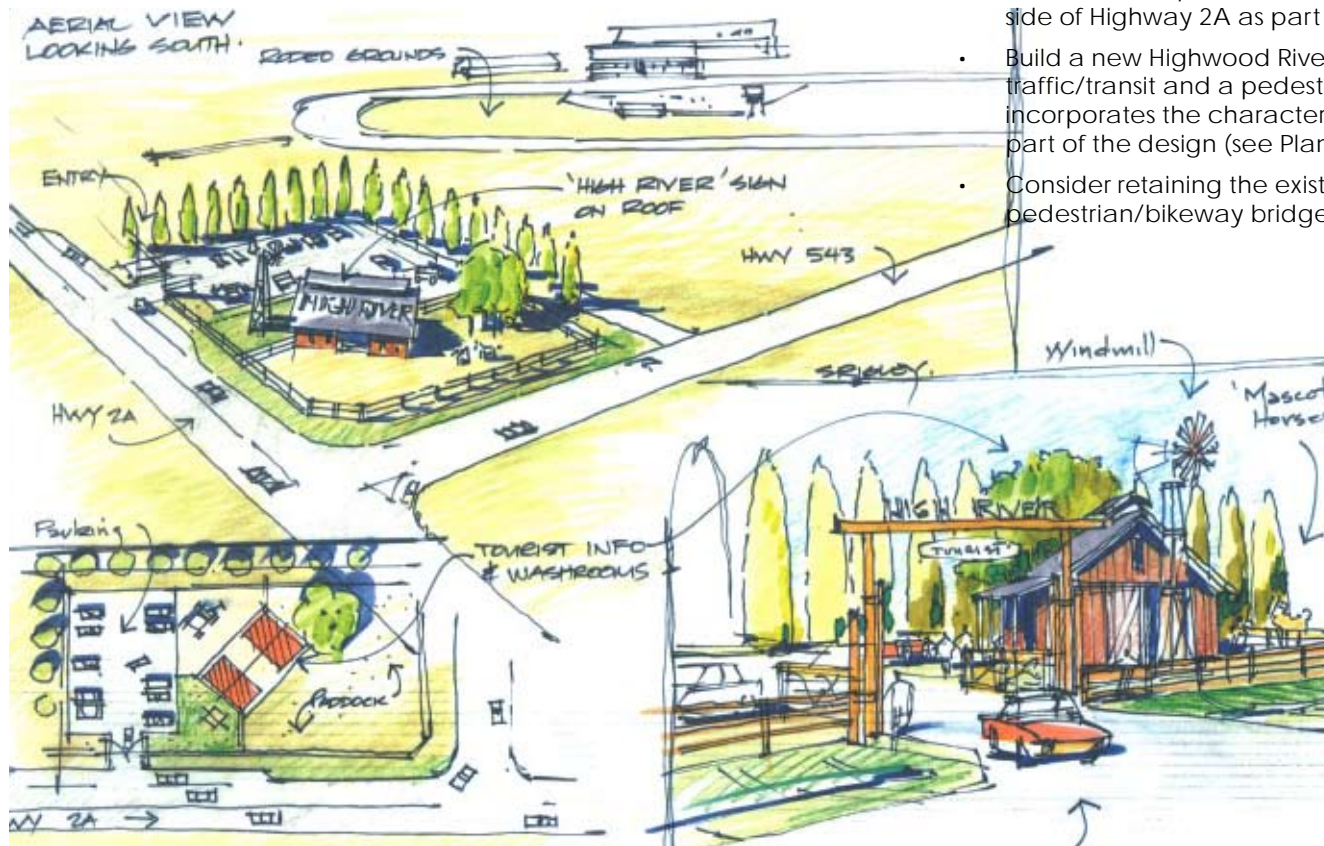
Potential North Gateway Welcome and Tourist Information Centre
